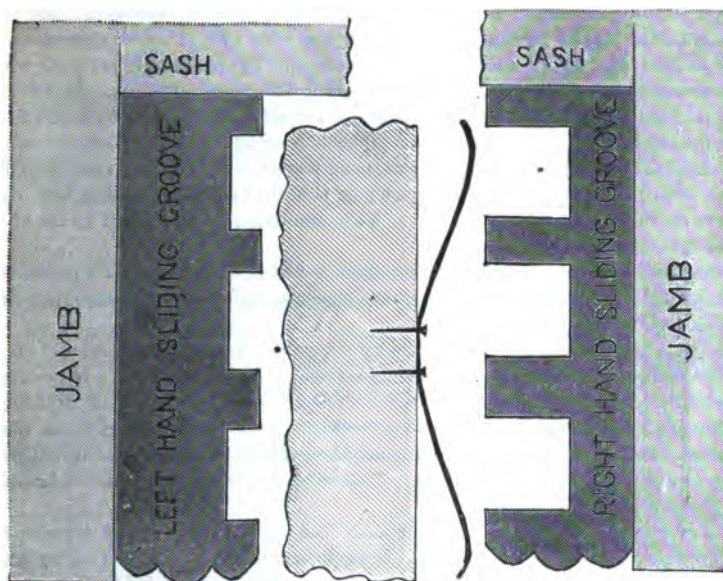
This is a full-sized representation of sliding grooves, showing the manner of adjusting them to window frame in place of the sash stop, and a reduced drawing of the friction spring as fastened to right-hand edge of blind.
